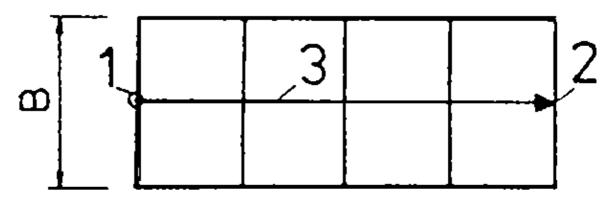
Layout (plan view) of the stair flight 1 stair foot (bottom step) at the stair flight line, 2 stair head (head step) at the stair flight line, 3 stair flight line, B stair flight width
